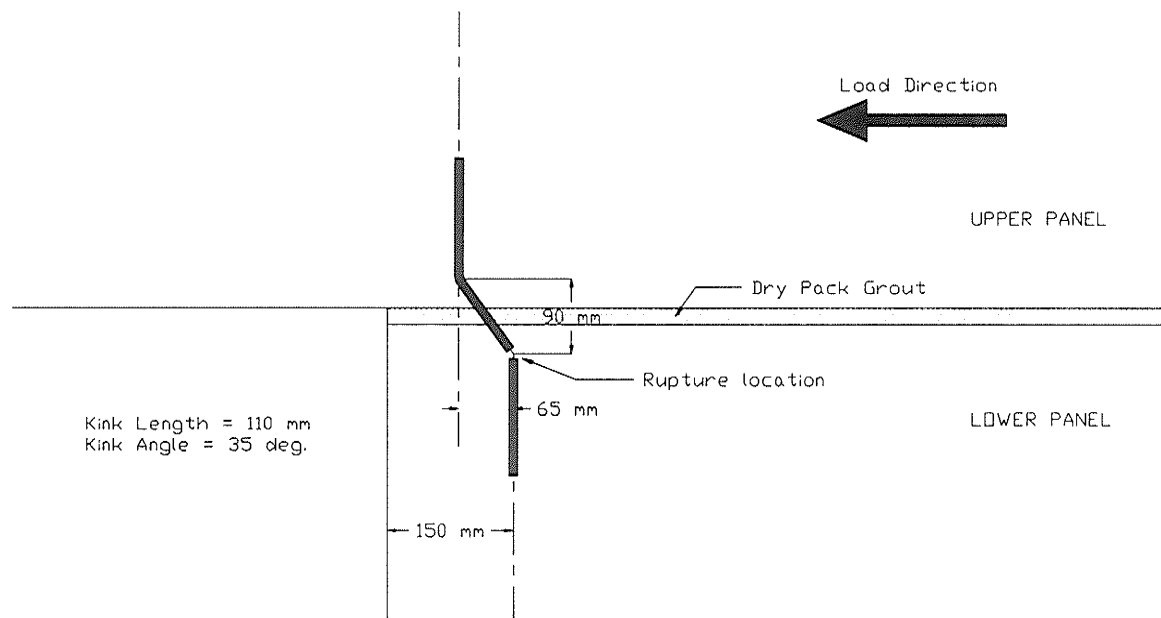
Specimen PTB-S - Deformed Shape of the East Bar at Rupture
